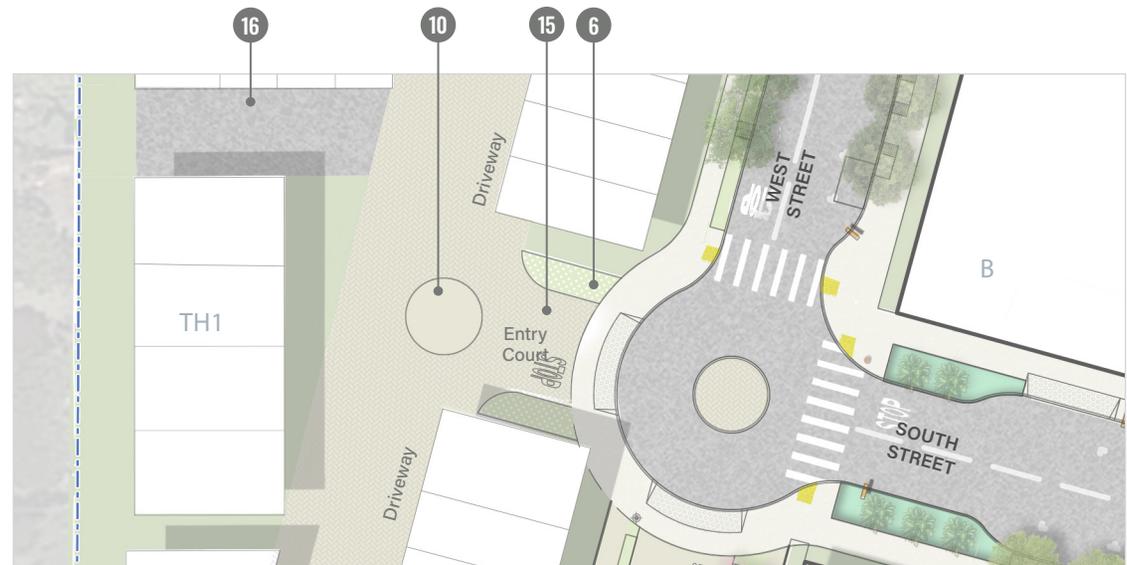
Townhome Entry Court, Site Plan L.1 & L.2
